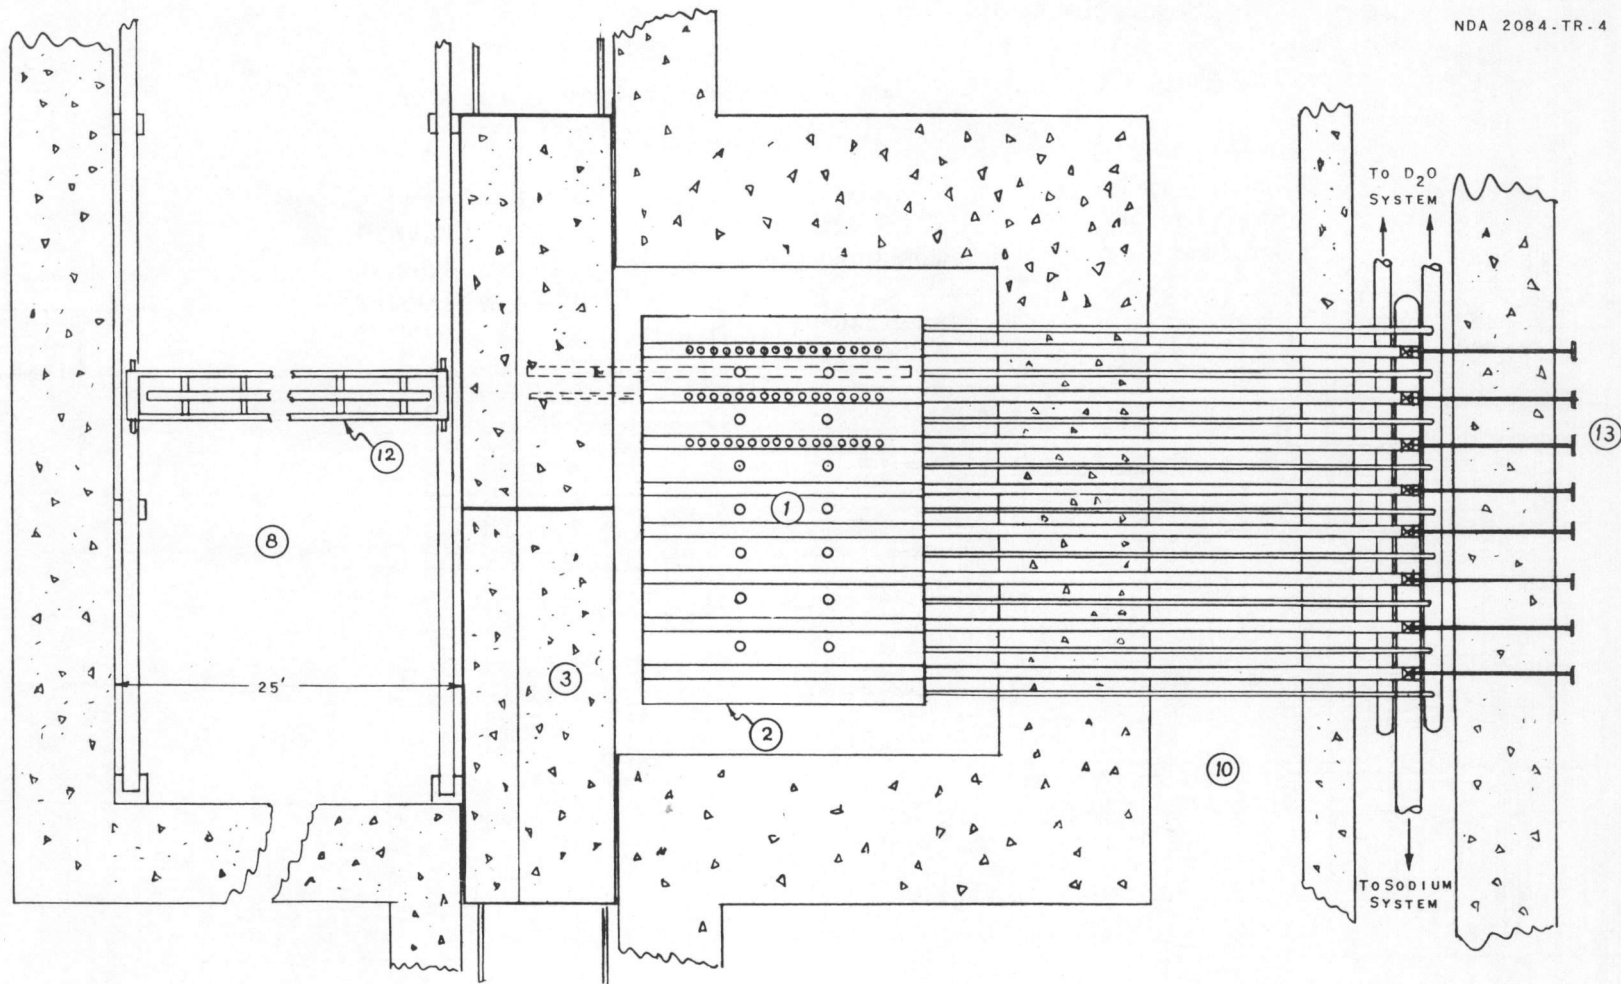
SDR — slab design — general arrangement — elevation
